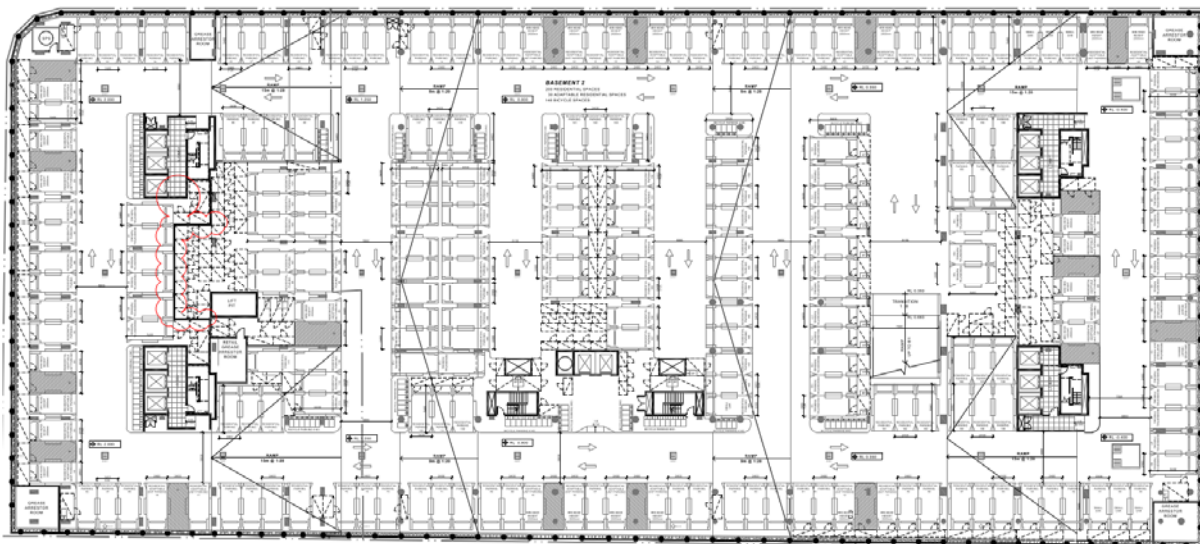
Proposed Basement level 2 plan under DA/961/2015/B. Source: Team2 Architects, Revision H-b, dated 14 December 2018
